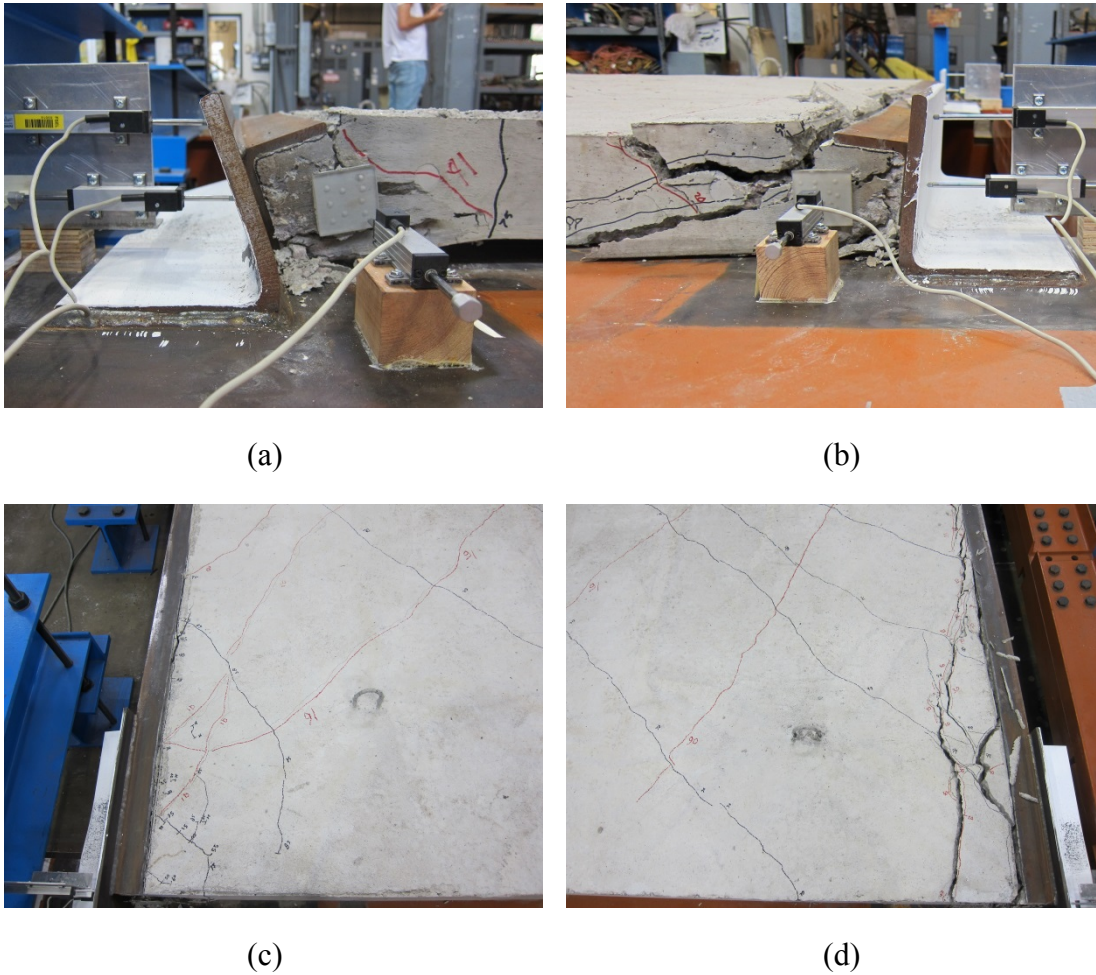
Elevation View at the South-East (a) and the South-West (b) Corners and Plan View at the South-East (c) and the South-West (d) Corners of Test 5 PCP at -1.4" of Panel Movement
